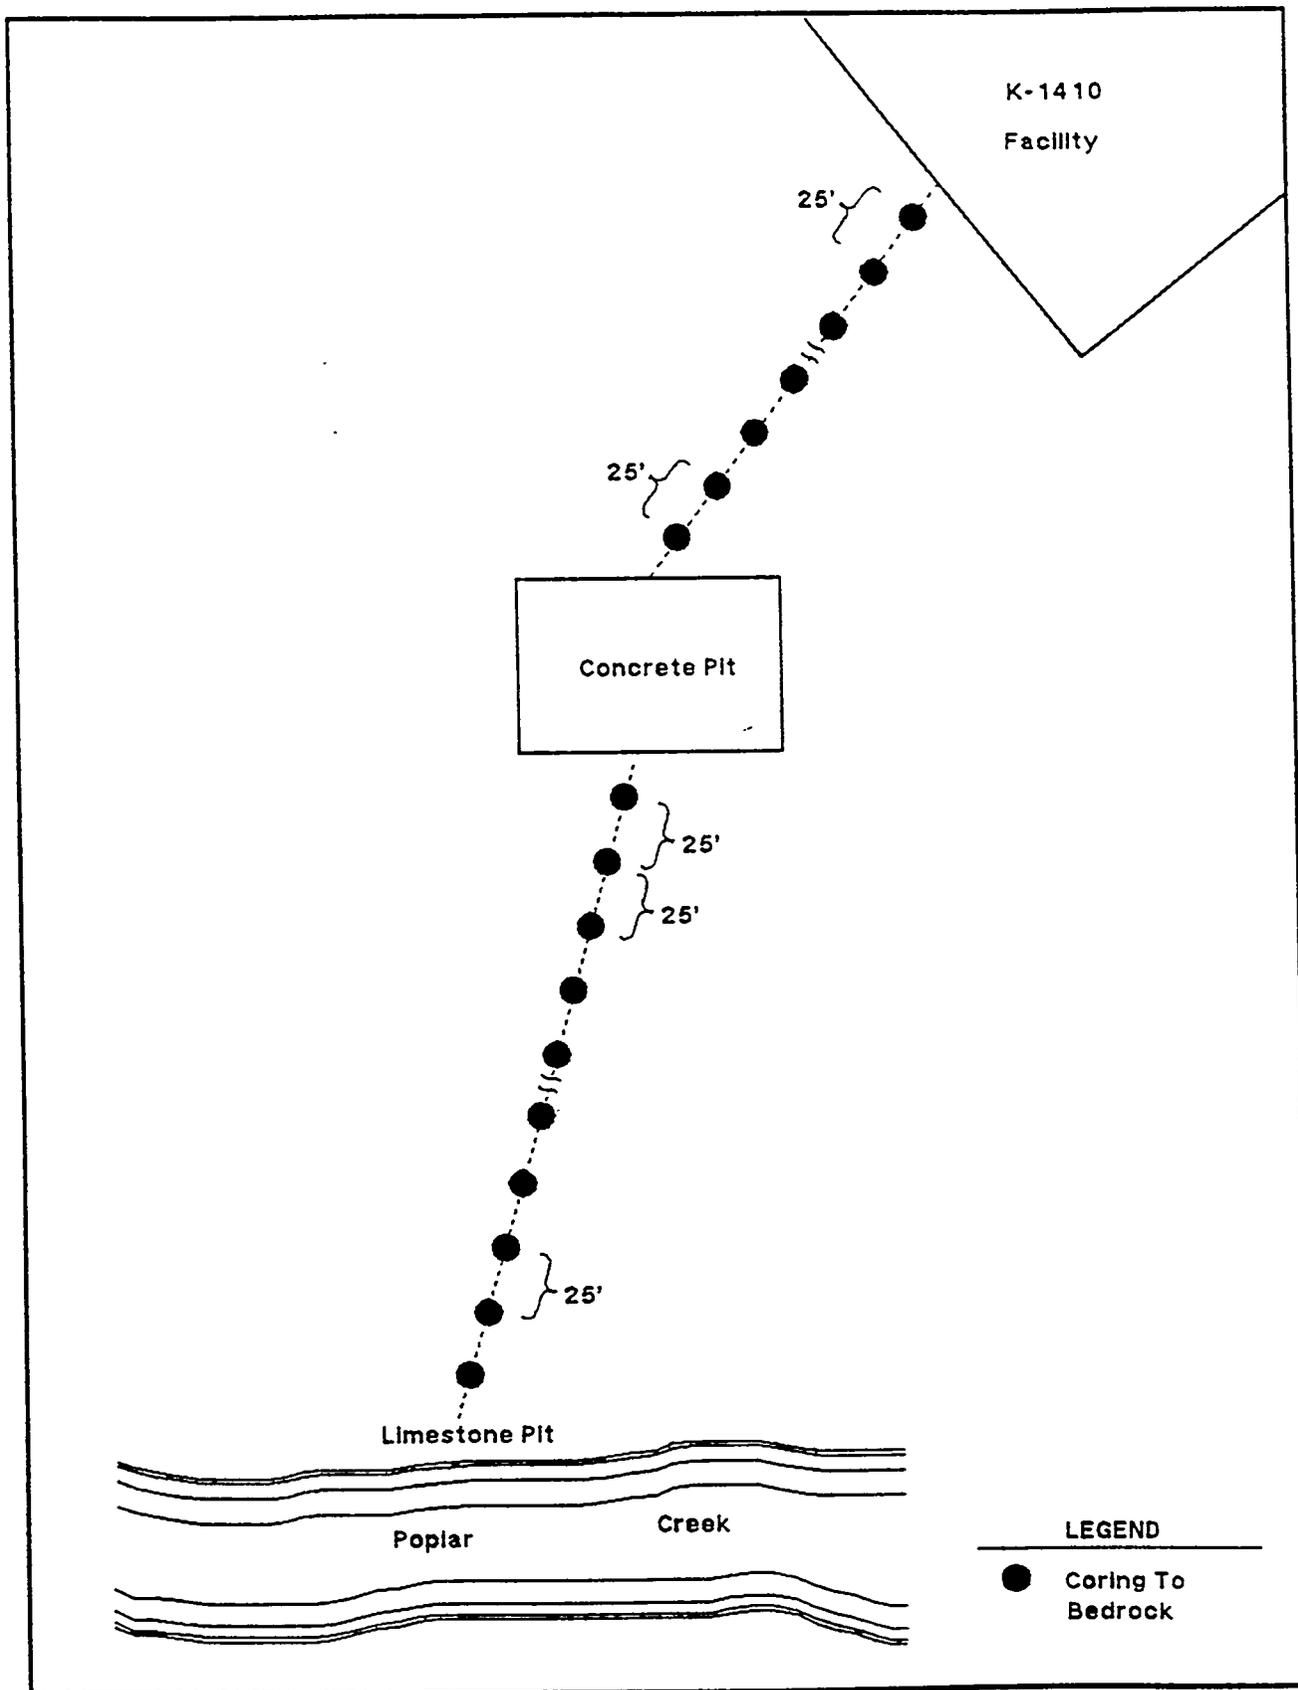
Soil sampling locations for the underground pipes of K-1410
